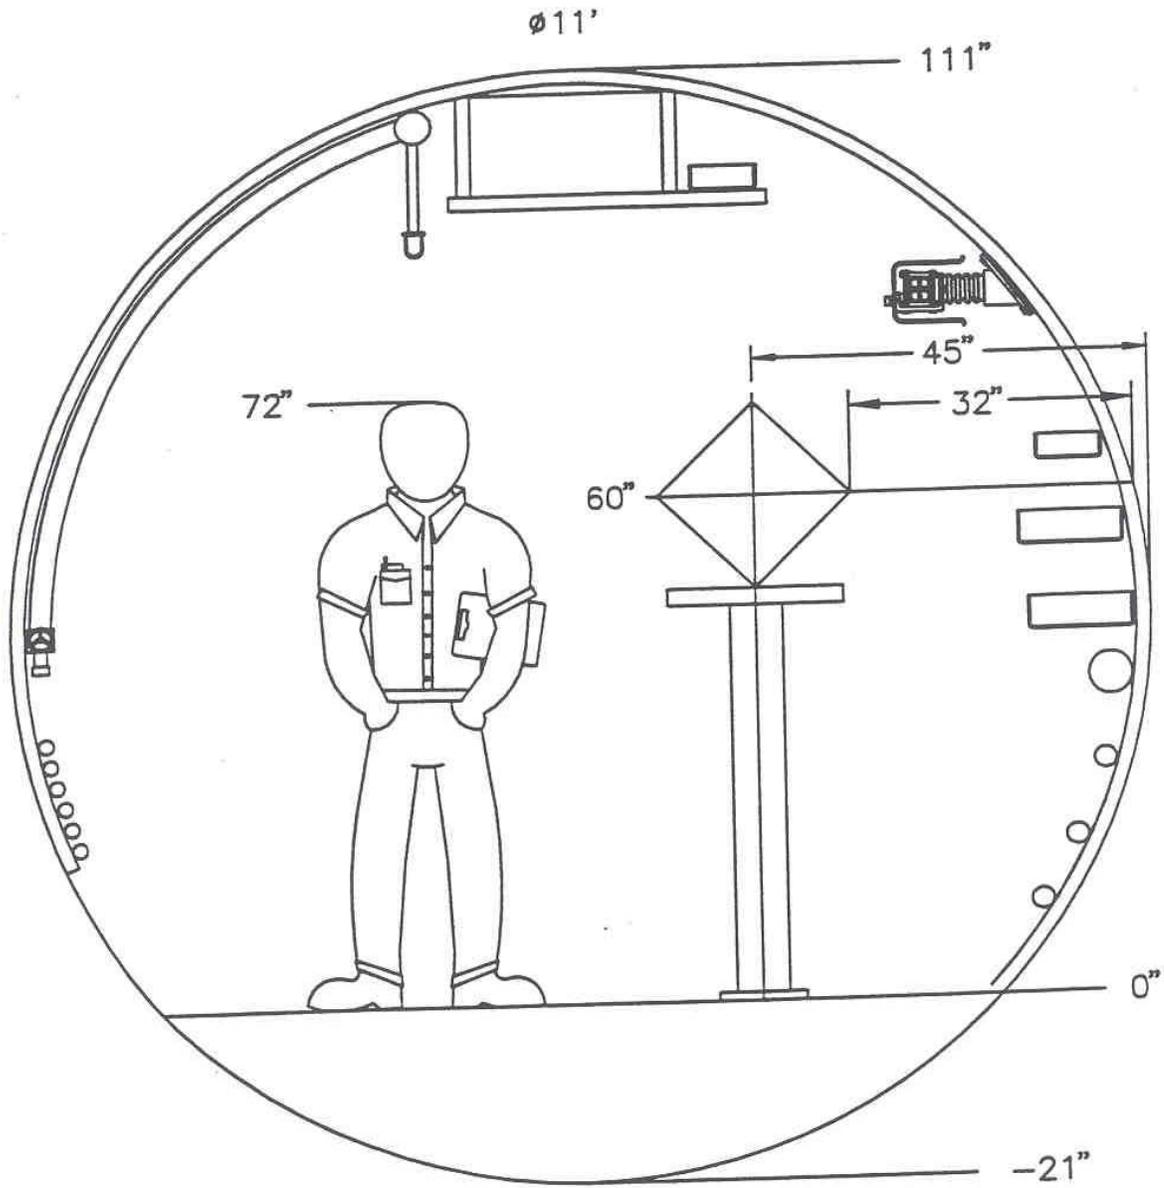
TYPICAL TUNNEL CROSS SECTION
